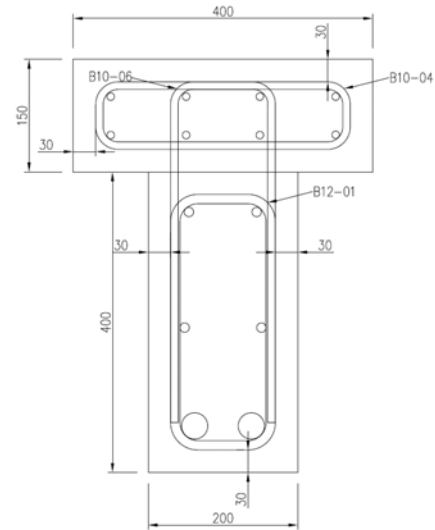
Section through TB2 and TB3 Test Specimens showing Reinforcement.
